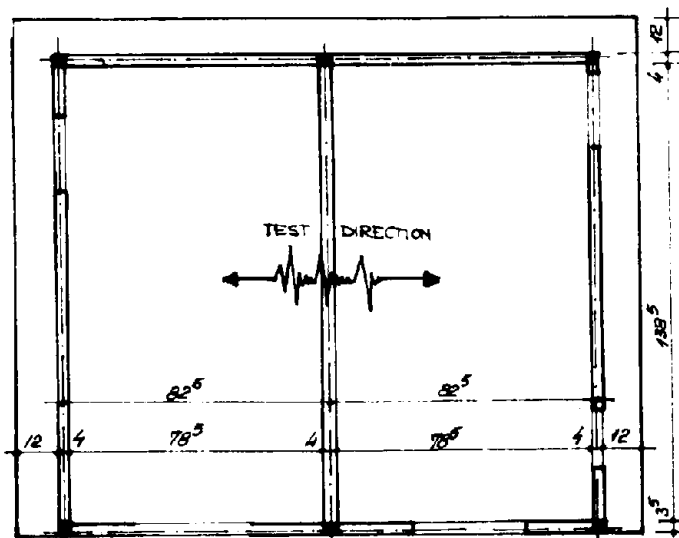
FLOOR PLAN OF A TYPICAL CORE MODEL WITHIN THE STRUCTURE IN FIG. 4
